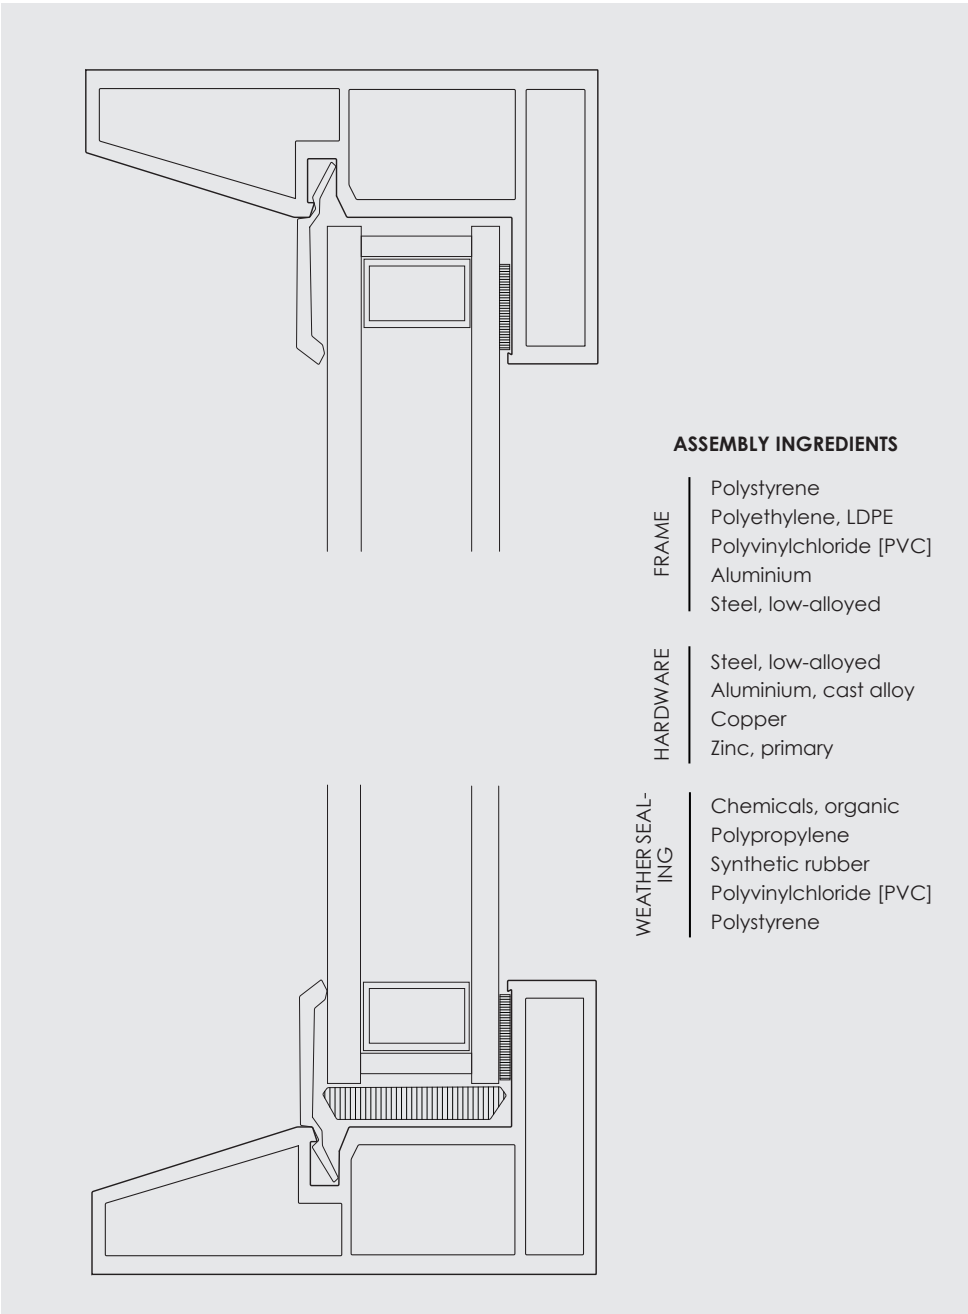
PVCu casement window detail: section detail and ingredients list
